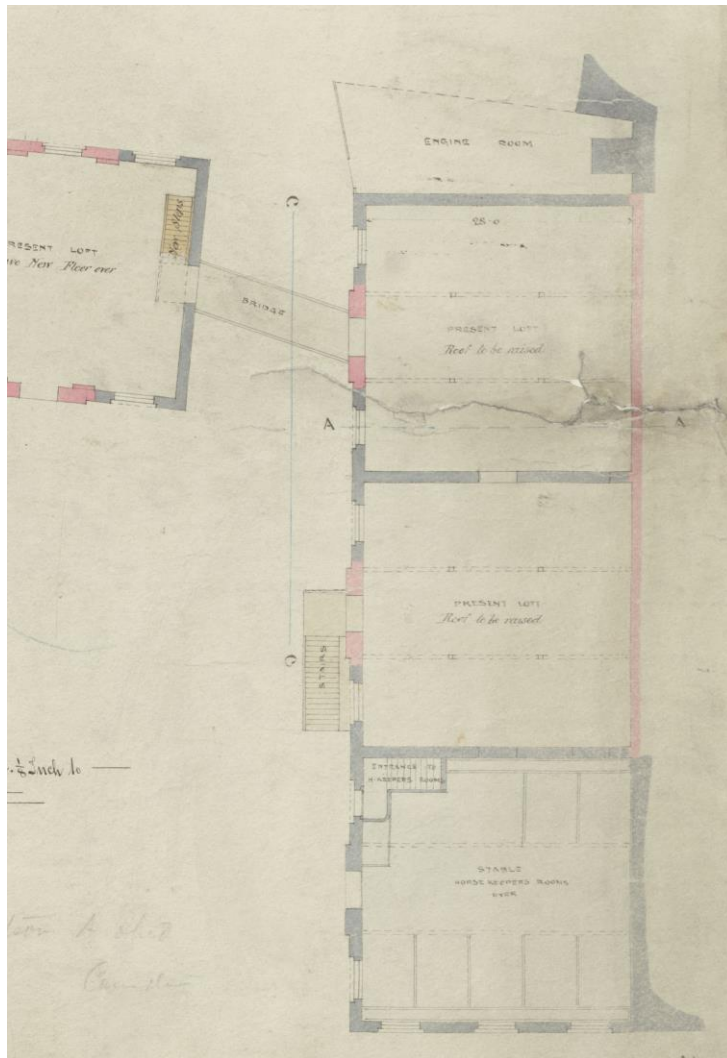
1881 plan of Tack Room showing the south end of Tack Room as 'engine room'.
